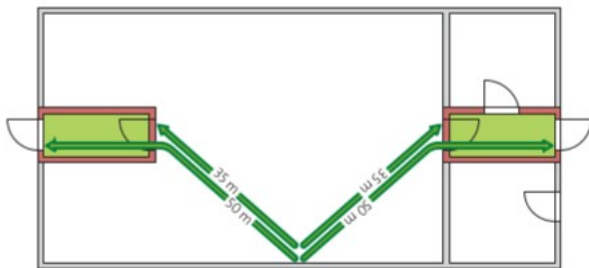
Arrangement of the escape route to one exit to a safe place without an AJP with a protected corridor
